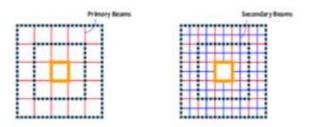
Beams in Tube-in-Tube Systems: Secondary beams help in transferring the gravity loads to the two tubes and the core.
